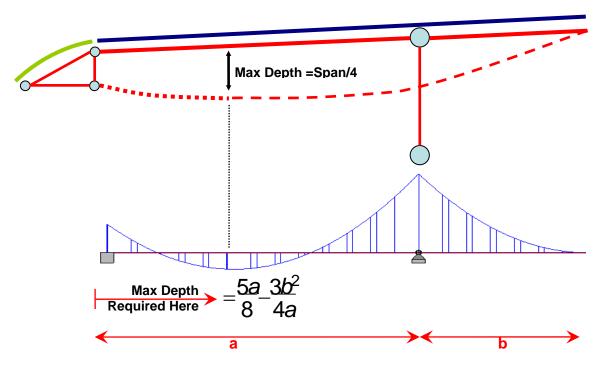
Elevation view of structure showing Tertiary truss chord geometry.
